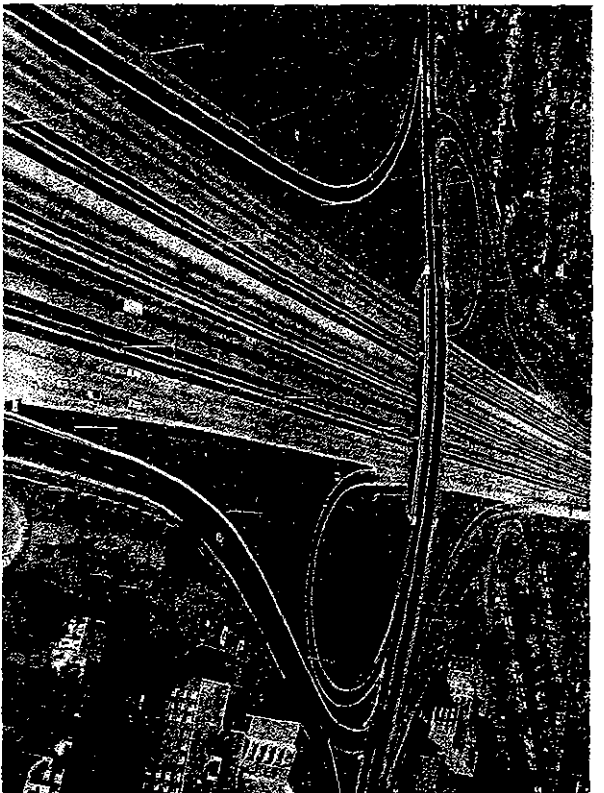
Intersection of Highway 401 and Avenue Road, Toronto
